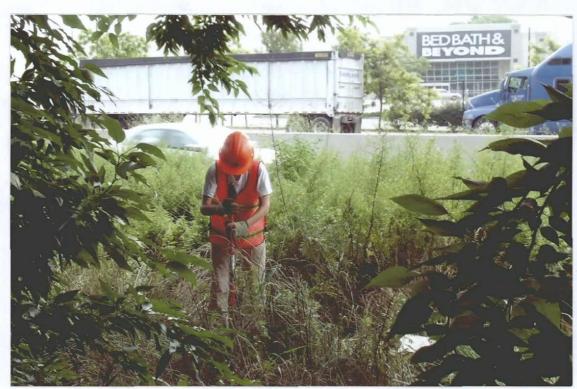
View west across Brooklyn-Queens Expressway from the vegetated strip that was subject to subsurface testing (excavation of STP 7).
